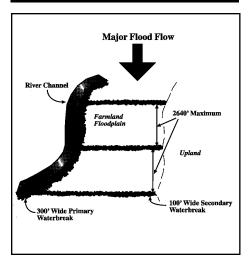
Simplified waterbreak layout designed to reduce flooding damage to farmland.
